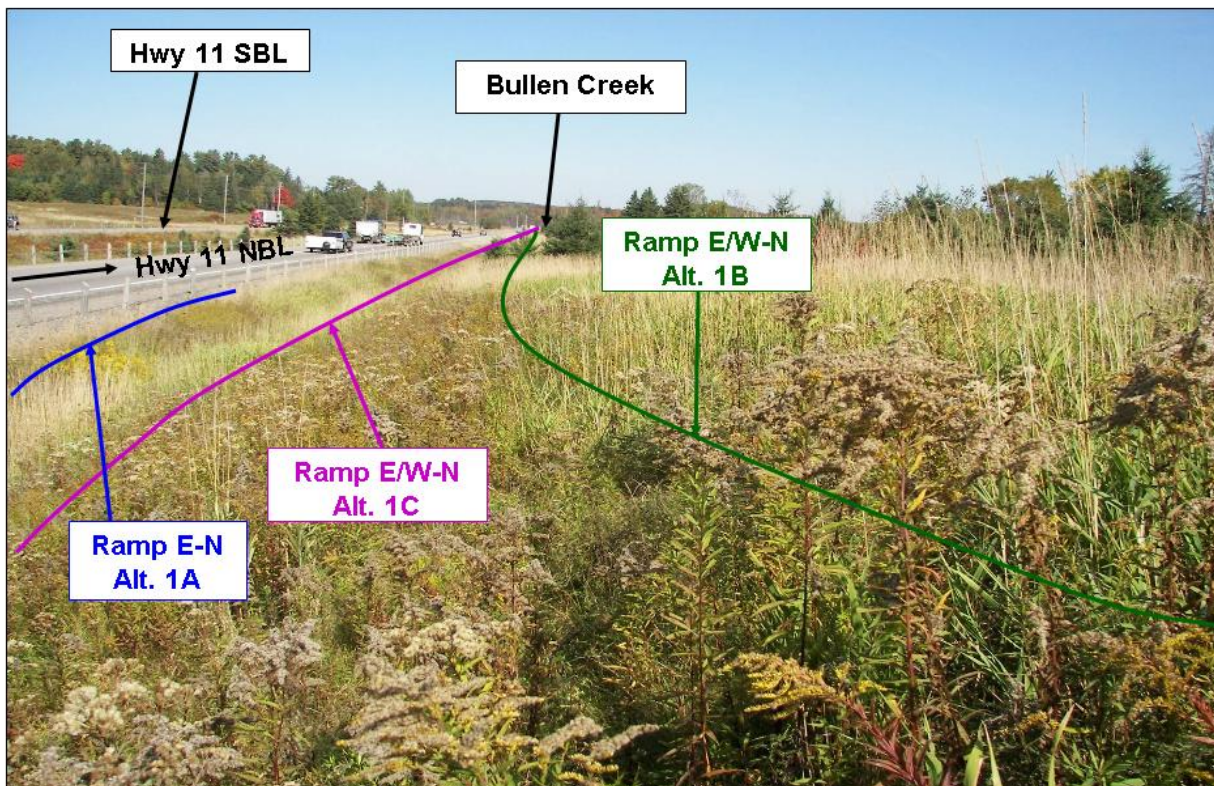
VIEW: Looking south from east shoulder of Highway 11 NBL at about Sta. 20+400. East abutments for underpasses for I/C at Sta. 20+200 (Alt. 1A and 1C) and at Sta. 20+300 are illustrated. Note swamps in foreground. High ground behind east abutments of Alt. 1A and 1C is a rock outcrop. (Sept. 26, 2008)
